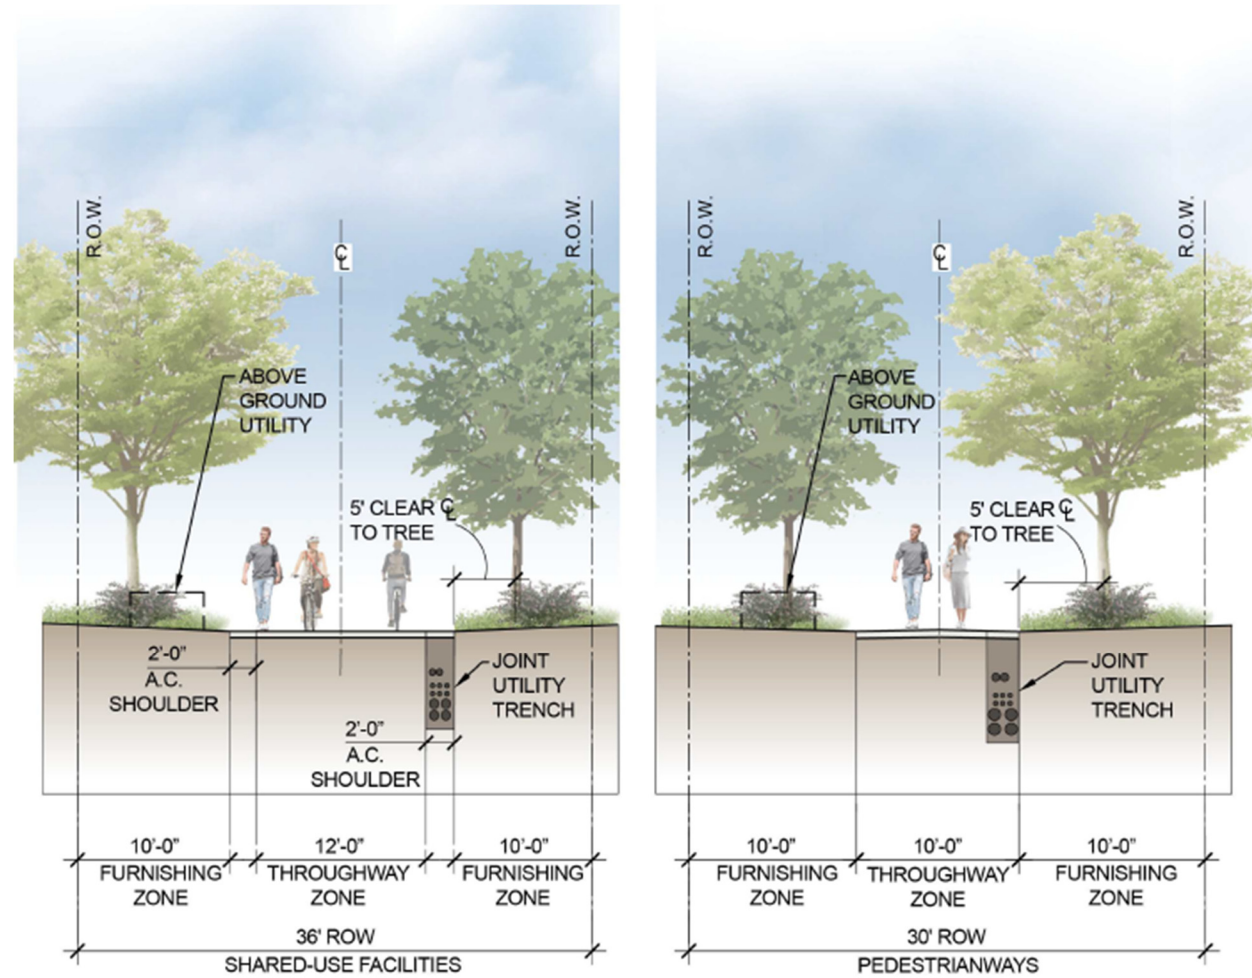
PEDSTRIANWAYS AND SHARED-USE FACILITIES SECTION VIEW
